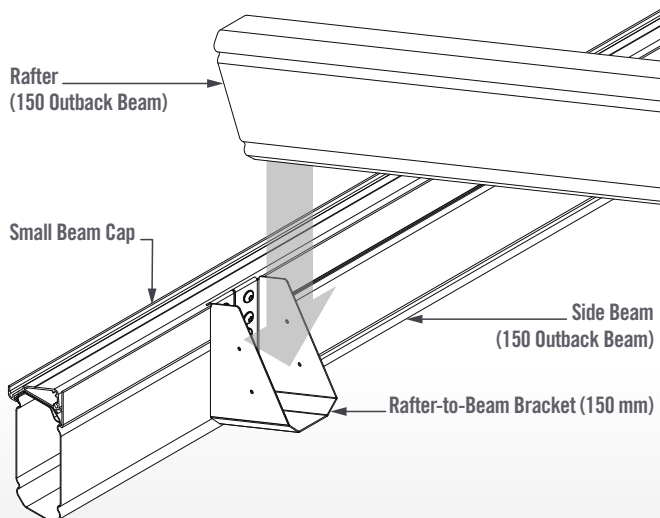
SMALL BEAM CAP - 150 SIDE BEAM - 150 RAFTER
